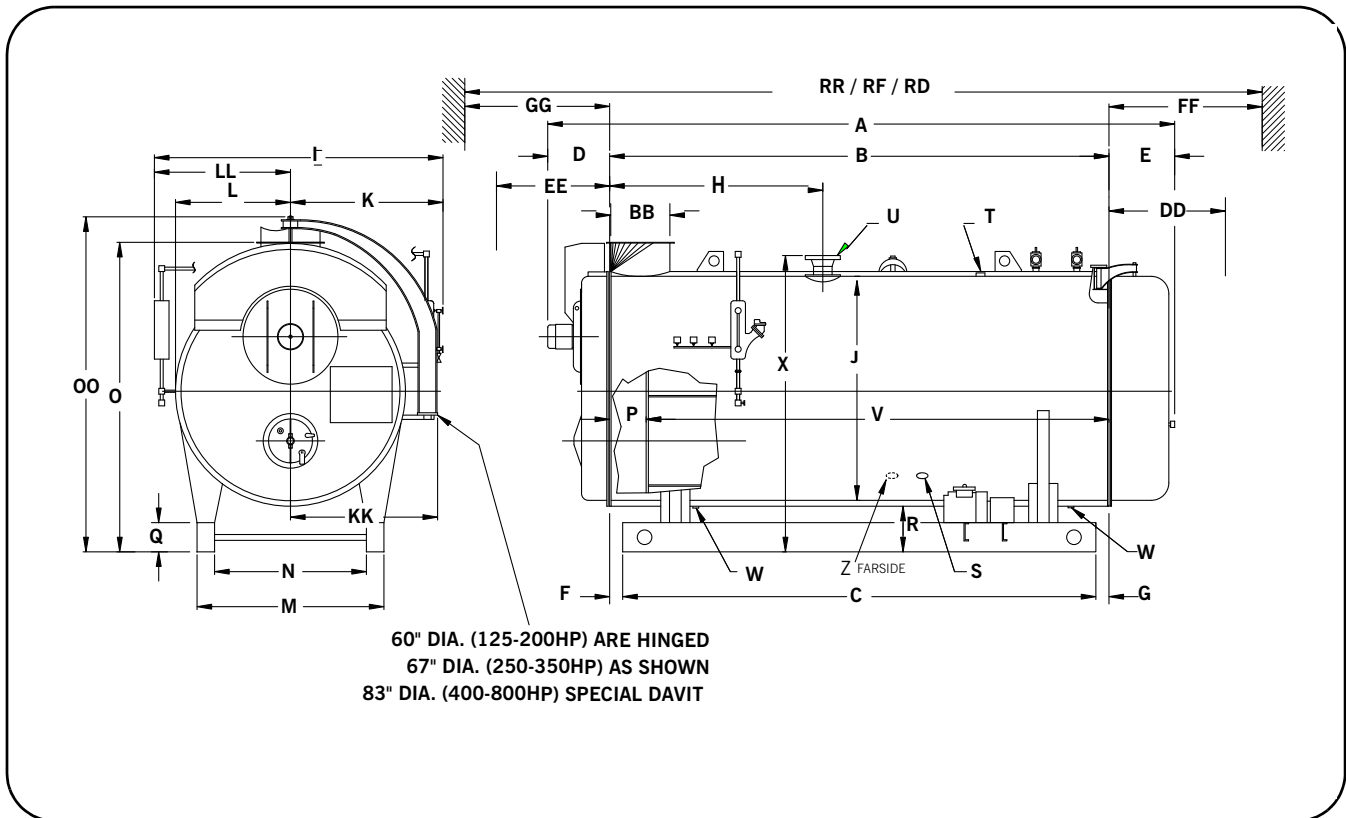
Model CBR Steam Boiler Dimensions - Sheet 2 of 2
